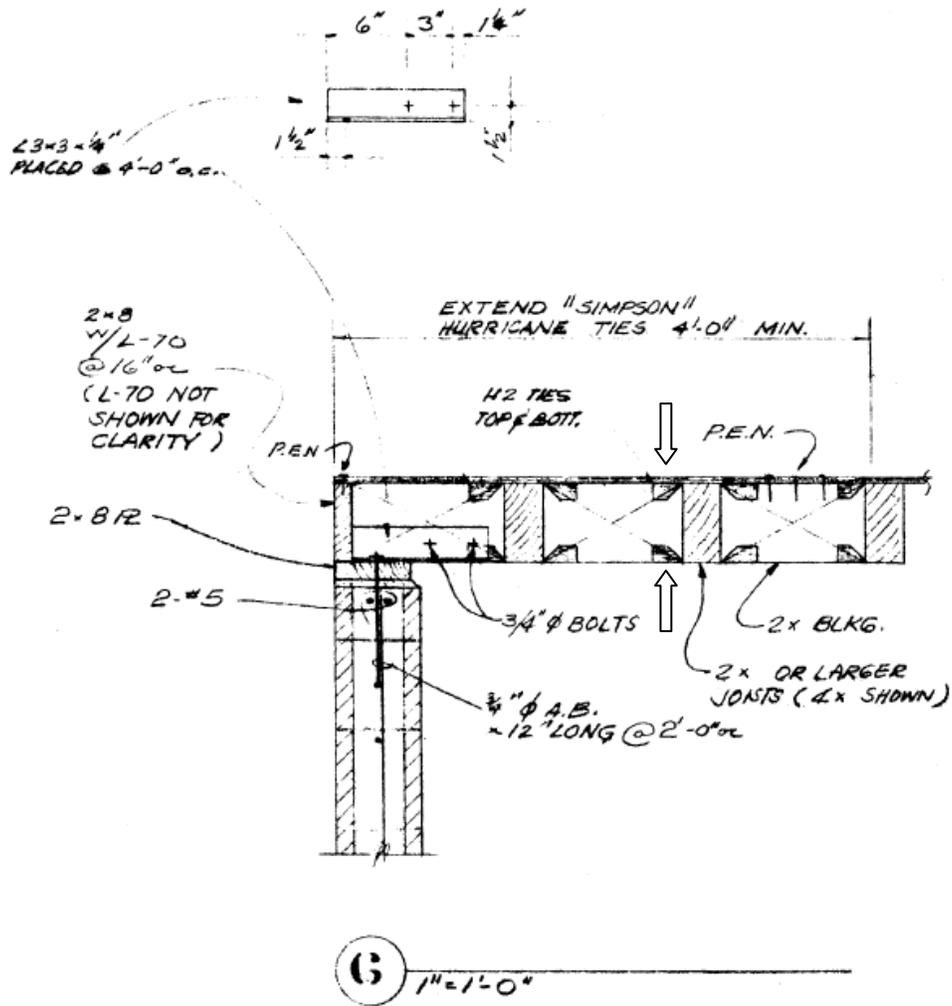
The wall-roof anchorage connection shown above is used in many places in Building B. In this connection, the weak links are the H2 metal brackets (see arrows). These are greatly overstressed.
